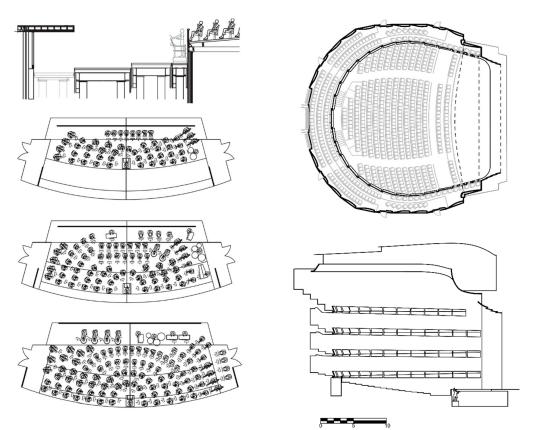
Pit lift configuration examples to maintain the orchestra close to the proscenium line. Plan and section of the opera house to the right.
